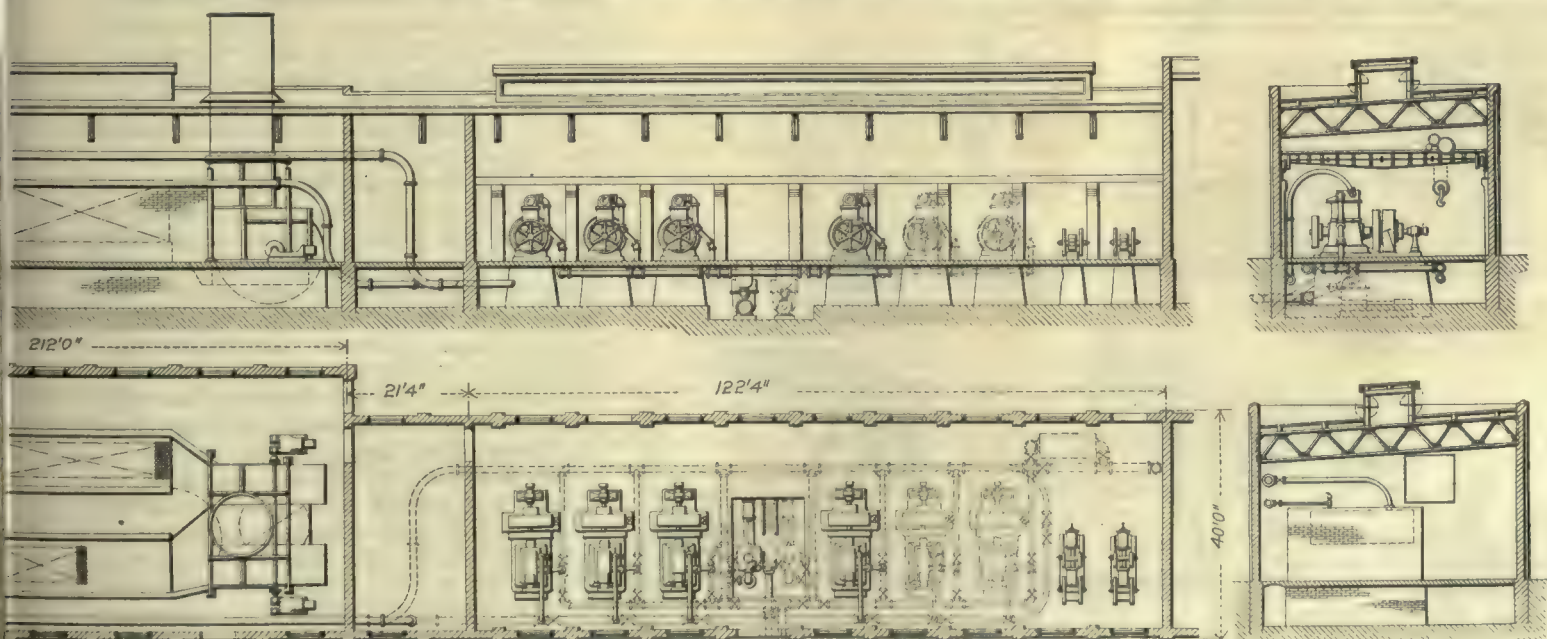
Plan and Longitudinal Section of Engine Room, and Cross Sections of Boiler and Engine Rooms.
